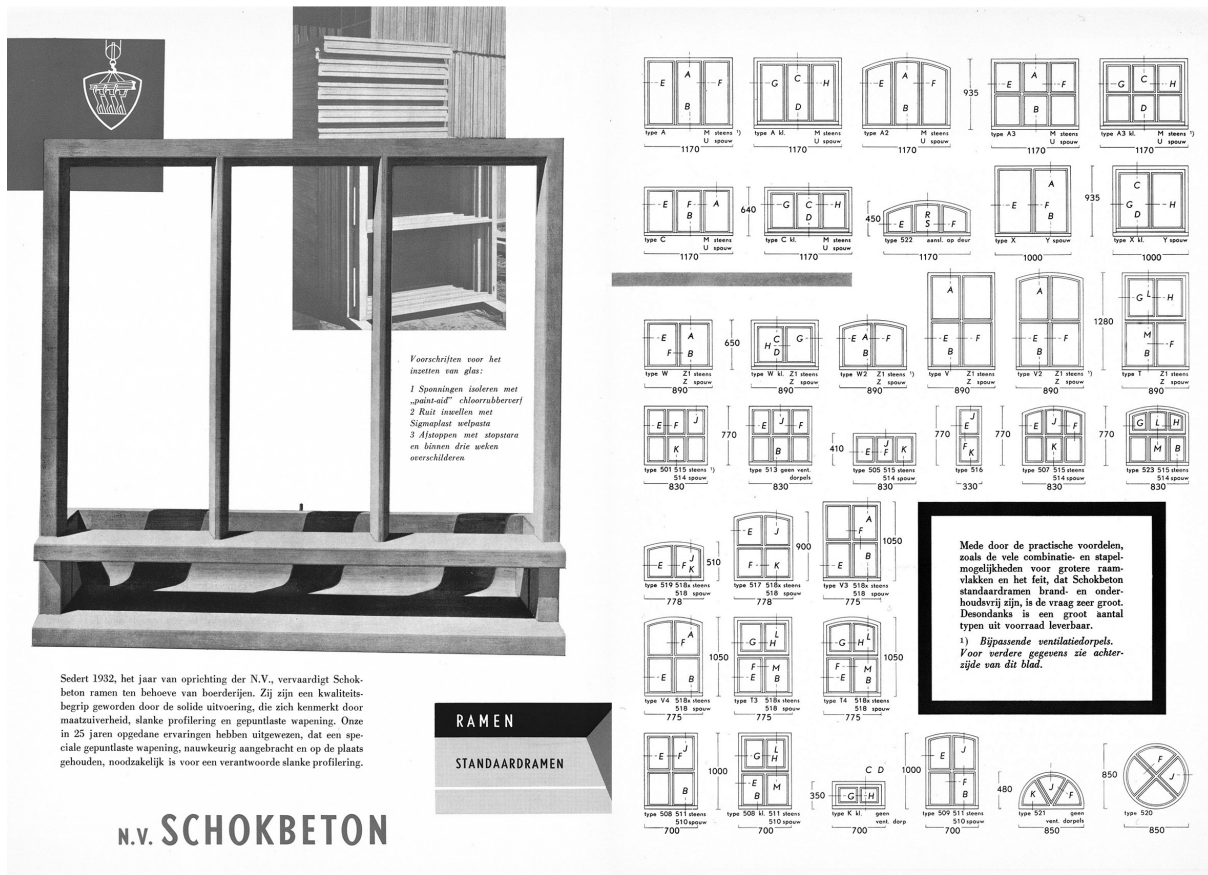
Two pages from a Schokbeton brochure on standard window frames (approx. 1960). © Schokbeton Collection Heritage & Architecture.
